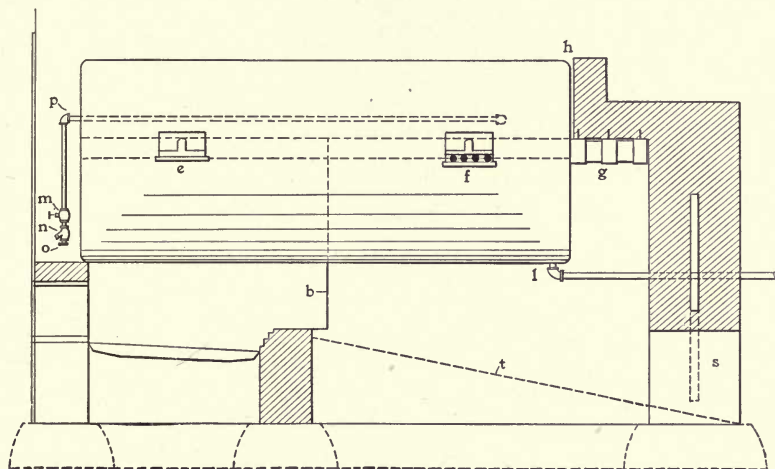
SIDE ELEVATION OF HORIZONTAL BOILER SETTING.
